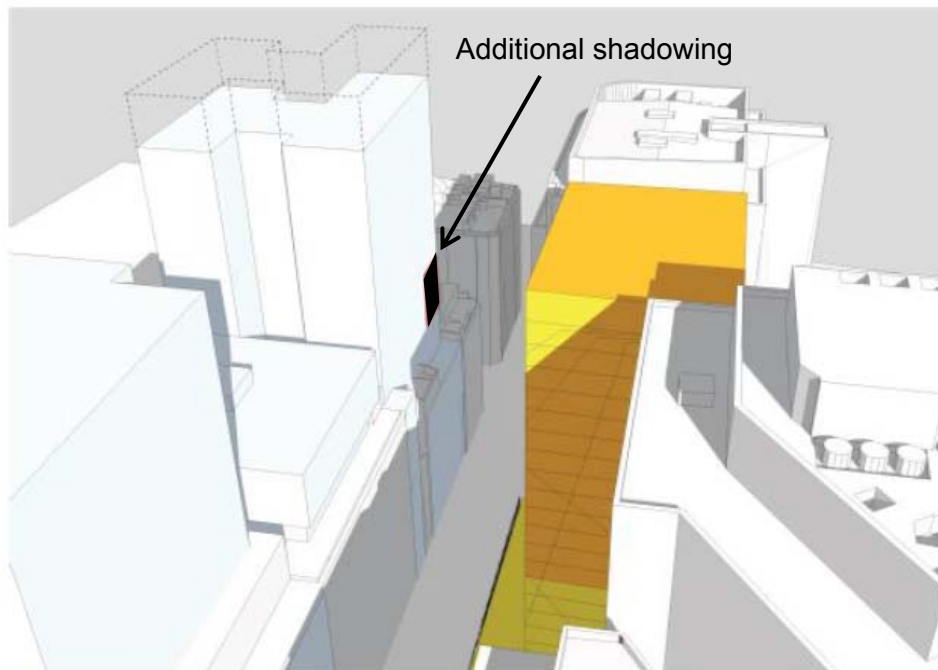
Additional over shadowing of 161 Clarence Street at 2pm
